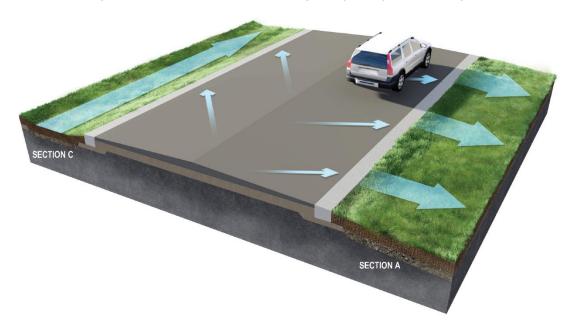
Application 4, Pavement flowing into grass buffer and swale
